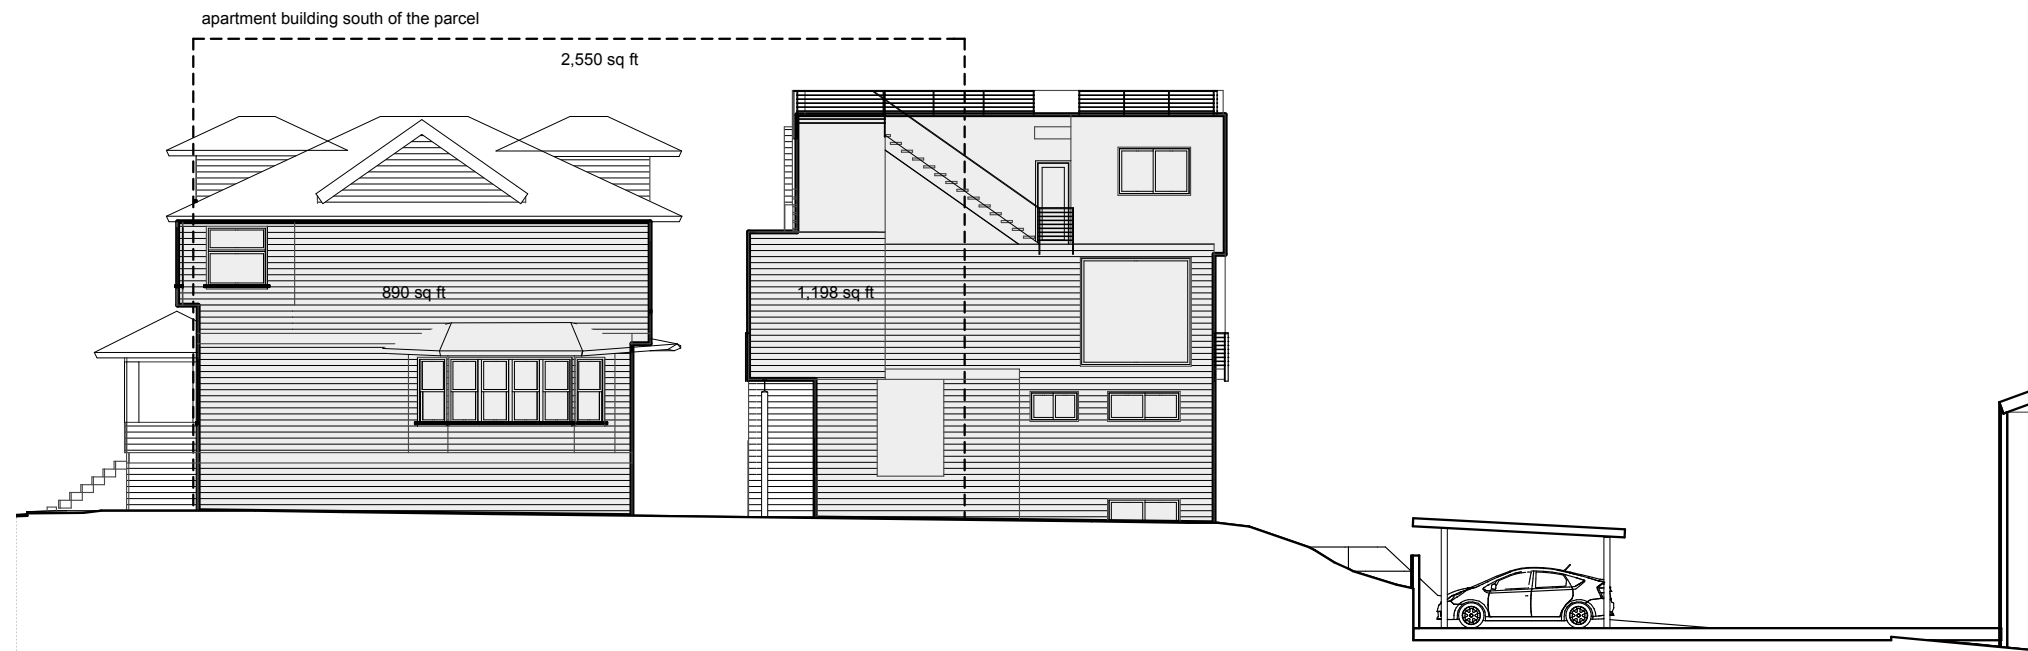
South Elevation View demonstrates wall area related to Façade Length.
